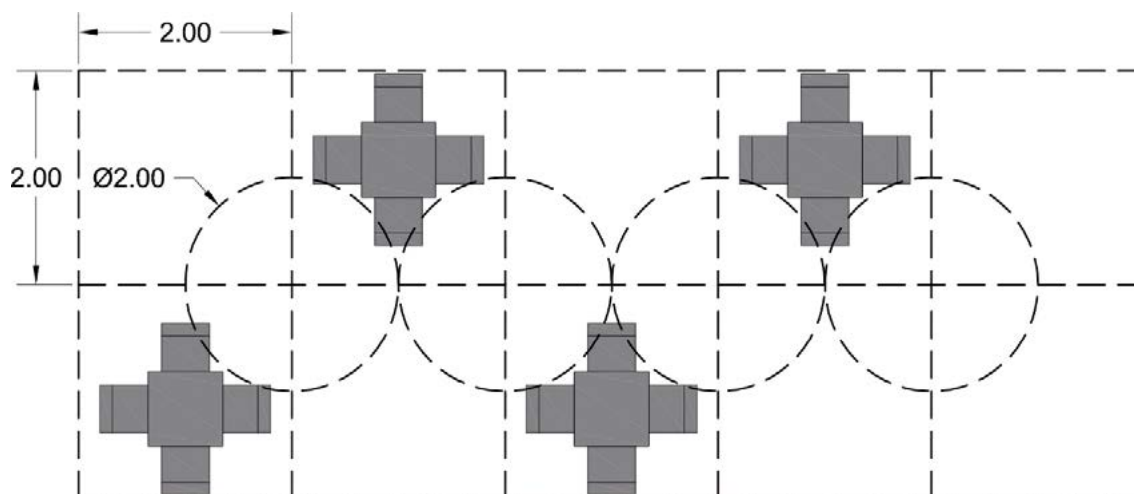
Example of garden furniture dimensions. Drawing by E.Nucera, JTP.
